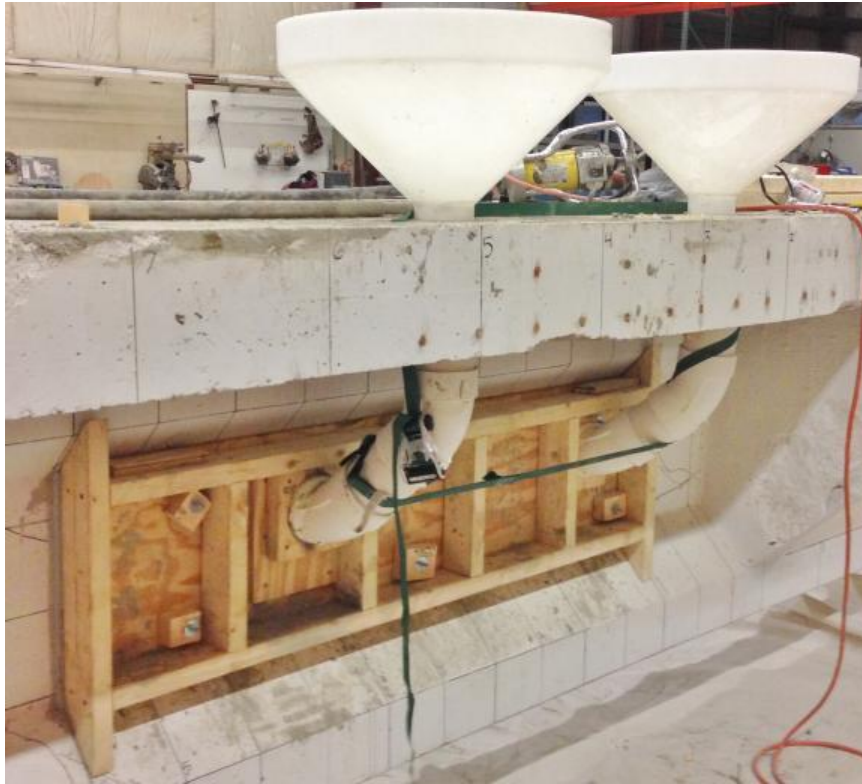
West Elevation of Core-Sampled Web Section
